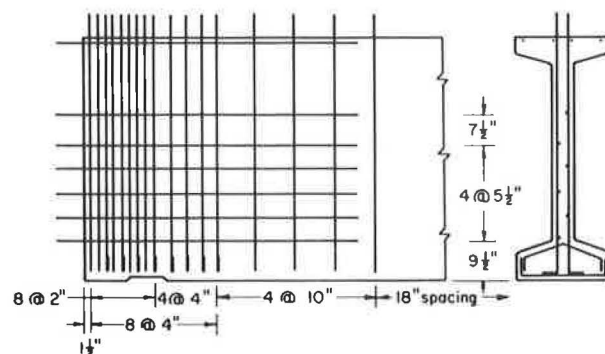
Details of steel reinforcement for Series 10 girder.
